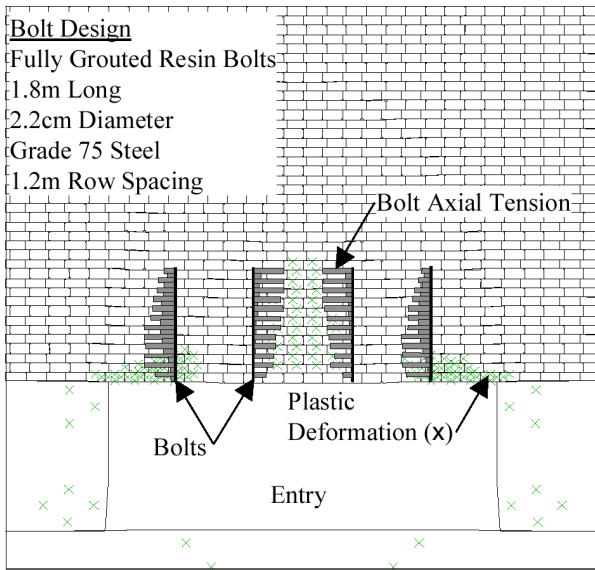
Stable Roof Support Design for a 3:1 Horizontal to Vertical Stress Ratio
